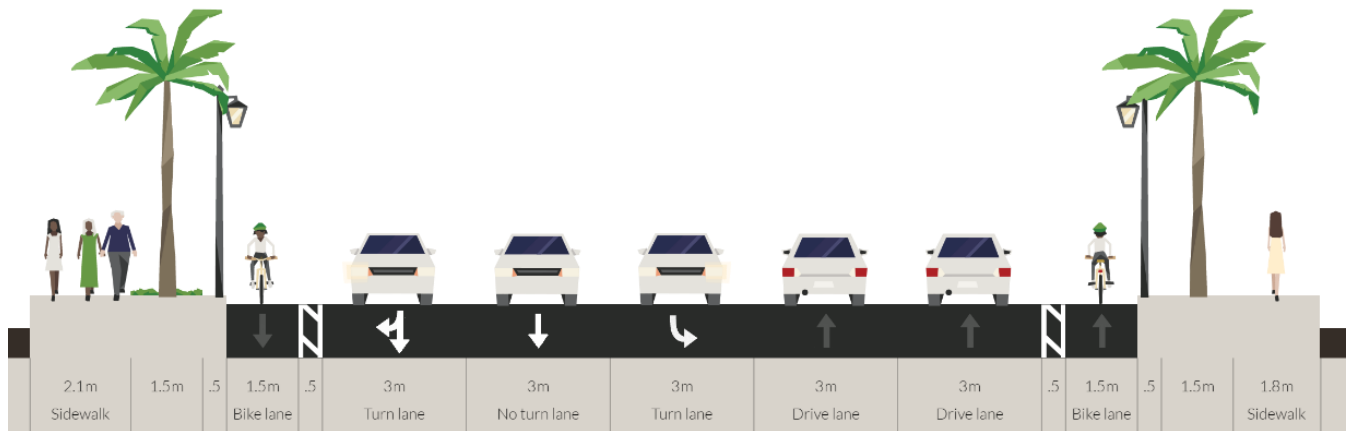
Recommended Cross-section of Park Home Ave. at Beecroft Rd. (Looking East)
